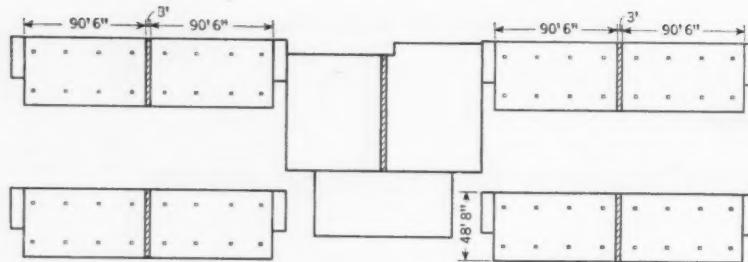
Women's dormitory housing 600 students consists of four three-story wings and a one-story administration building in center.
